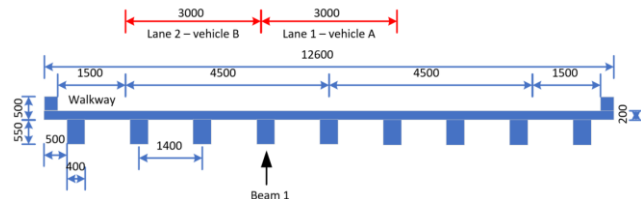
Cross-section of the concrete beam bridge. Measurements are given in mm.
